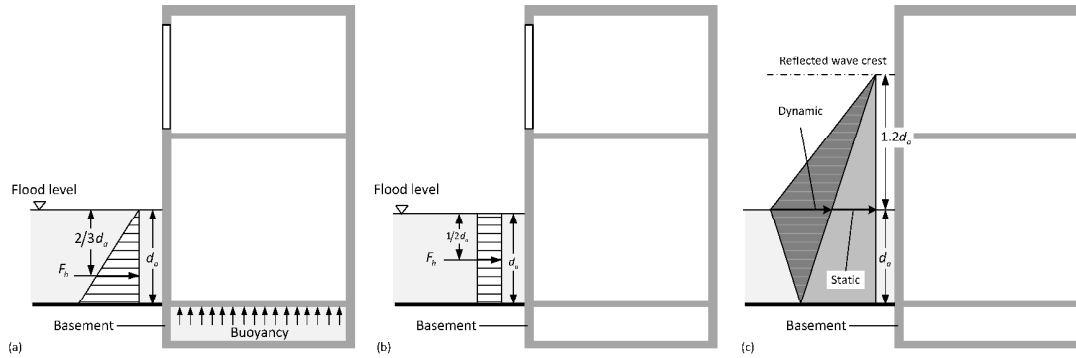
Schematic understanding of flood loads in buildings. a) Hydrostatic load pressure, b) Hydrodynamic load on buildings; (c) Horizontal breaking wave impact load on the external wall. Retrieved from: [13]
